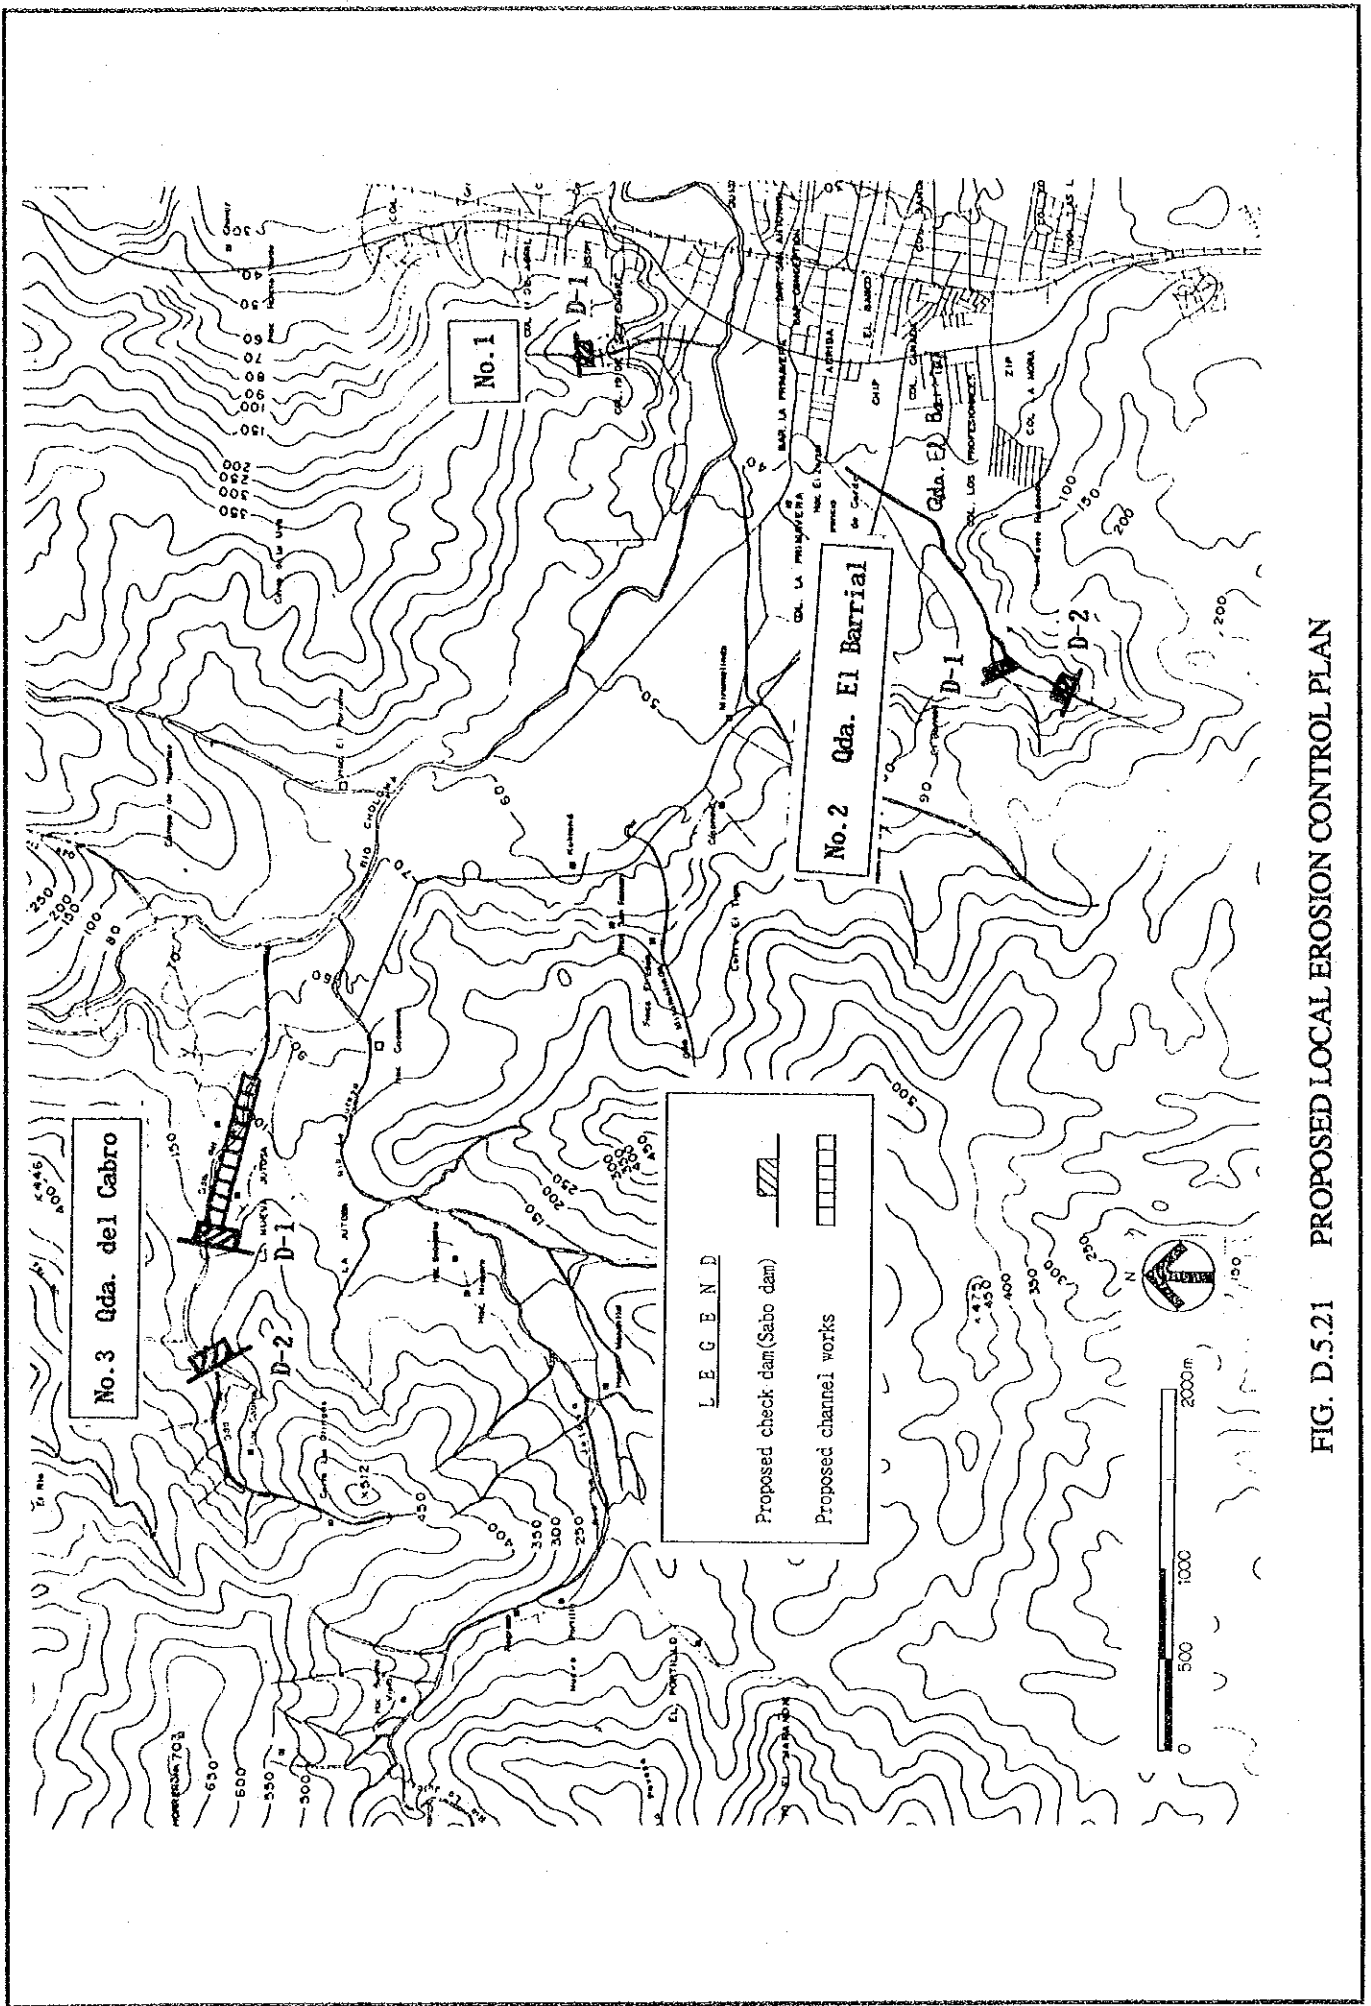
PROPOSED LOCAL EROSION CONTROL PLAN
